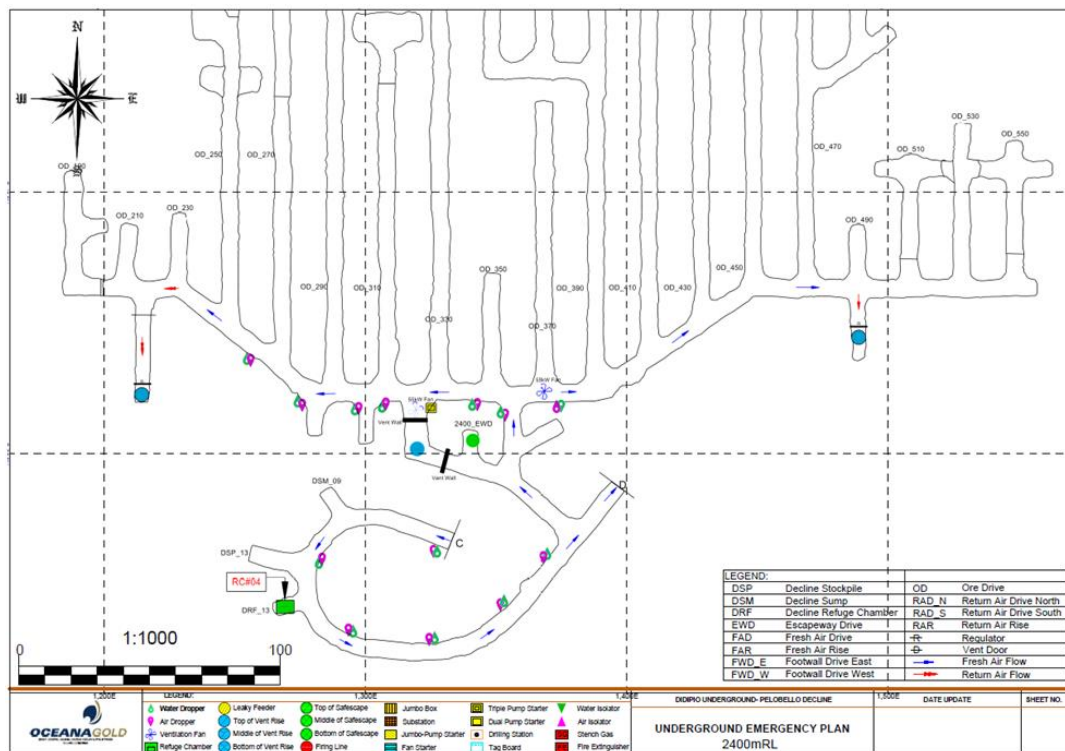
Didipio Existing and Planned Escapeway System and Refuge Chamber Locations
